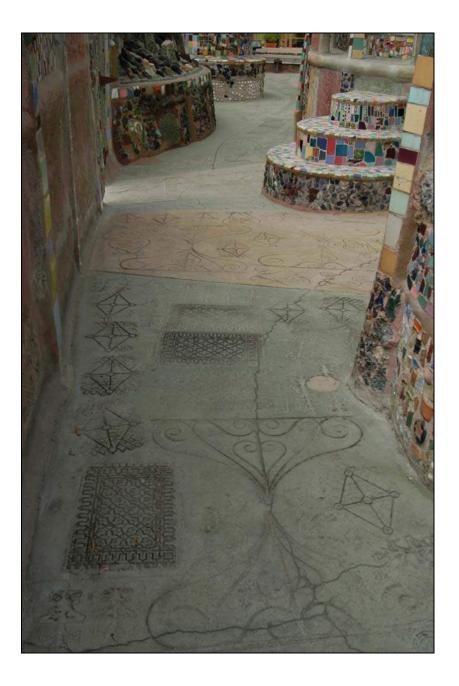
Floor at south side of Center Tower with crack circling the perimeter of the tower approximately 2 feet from the base.
